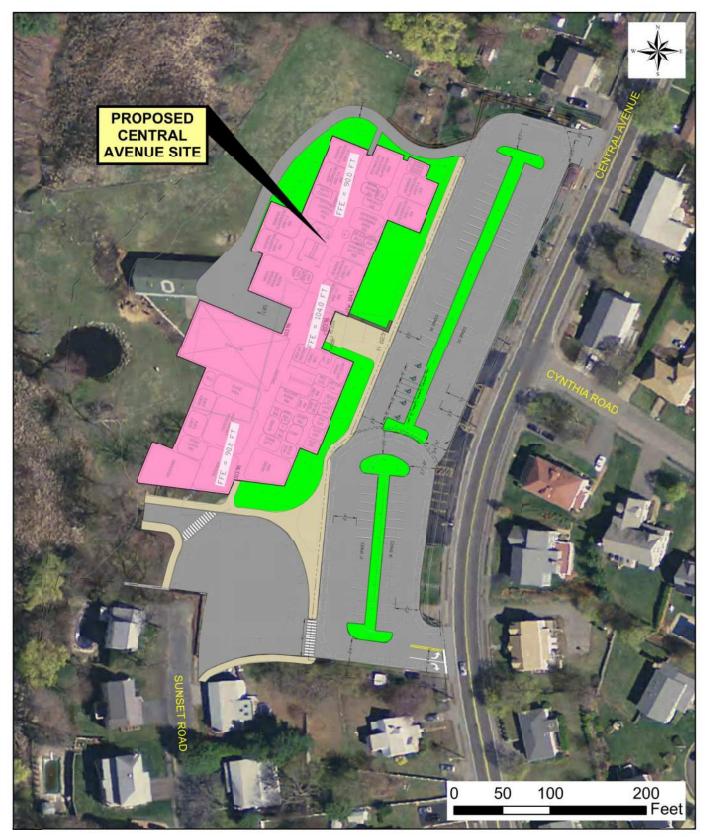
Proposed Site Driveway Hillside Elementary School Needham, Massachusetts
